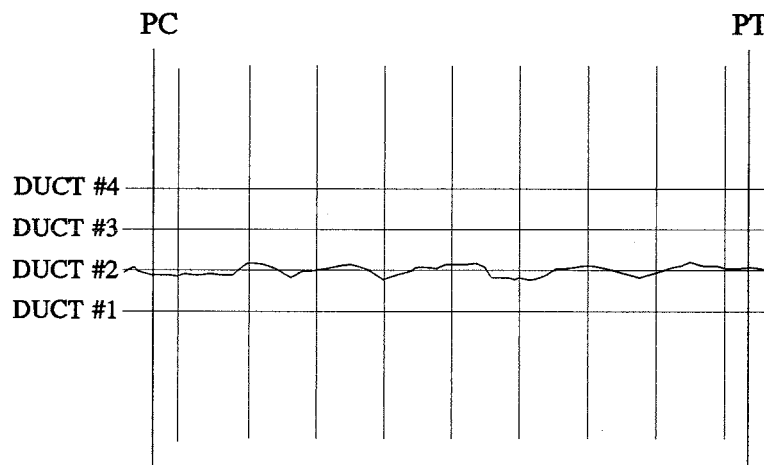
Typical First Crack (Flexural) for All Specimens.
